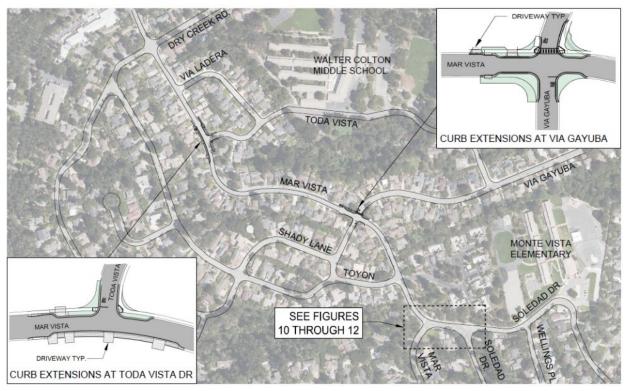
Traffic Calming Plan for Mar Vista Drive (2023 update)
